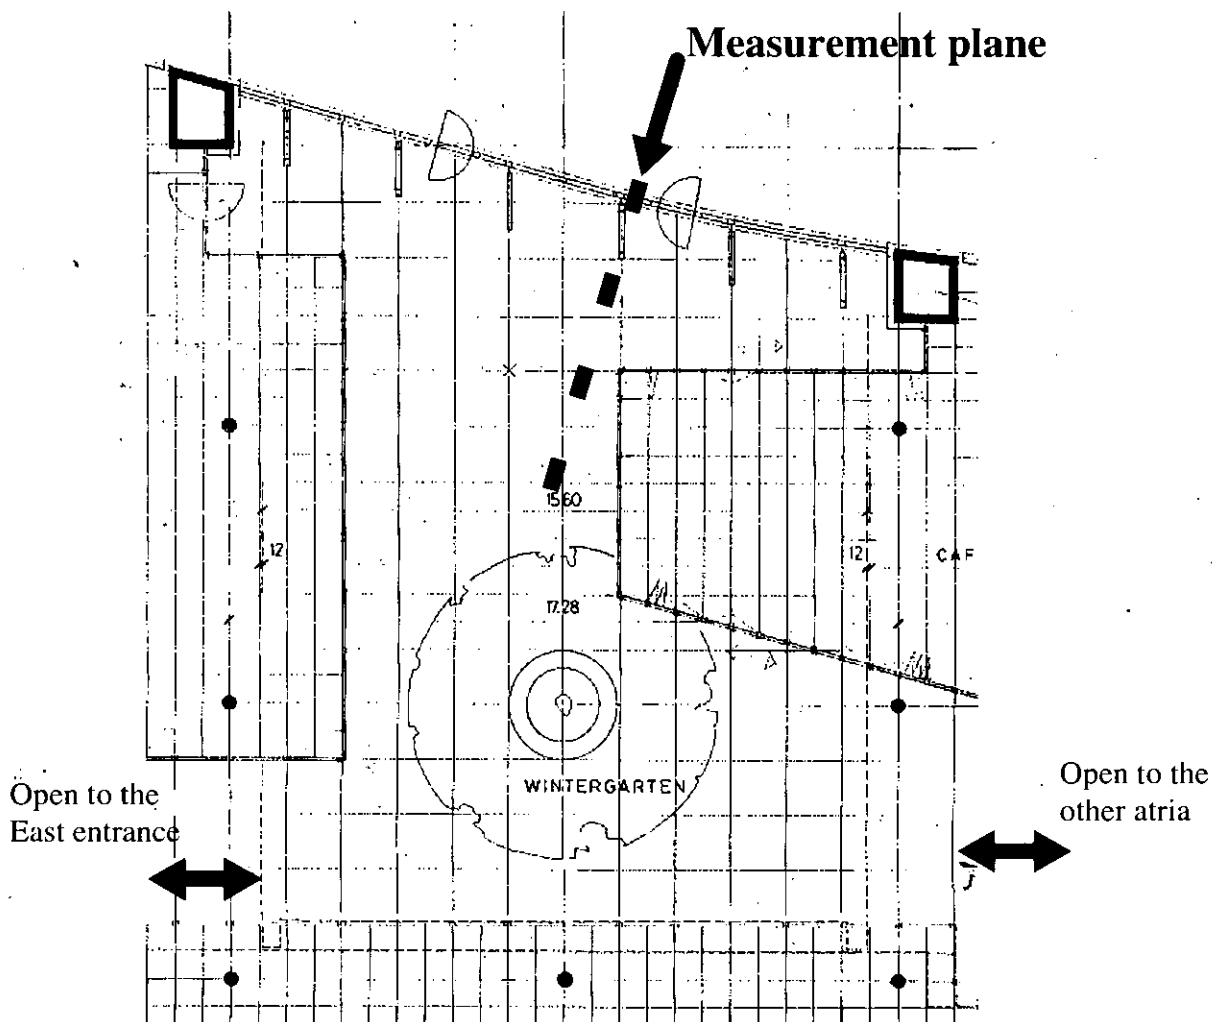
Ground floor plan of atrium 'East', showing location of measurement plane.
